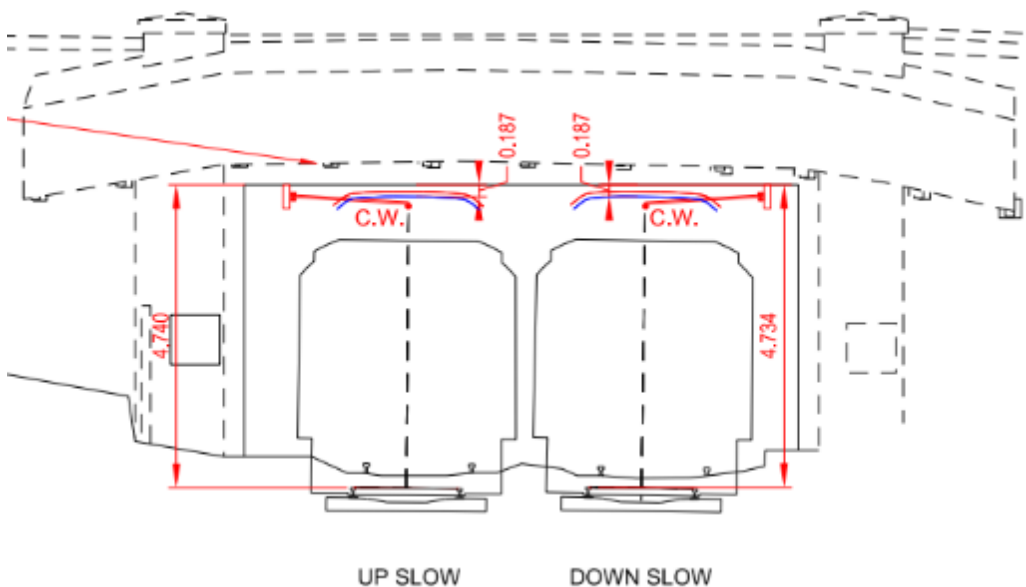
Example Cross Section for Fitted OHLE System in Twin Area
